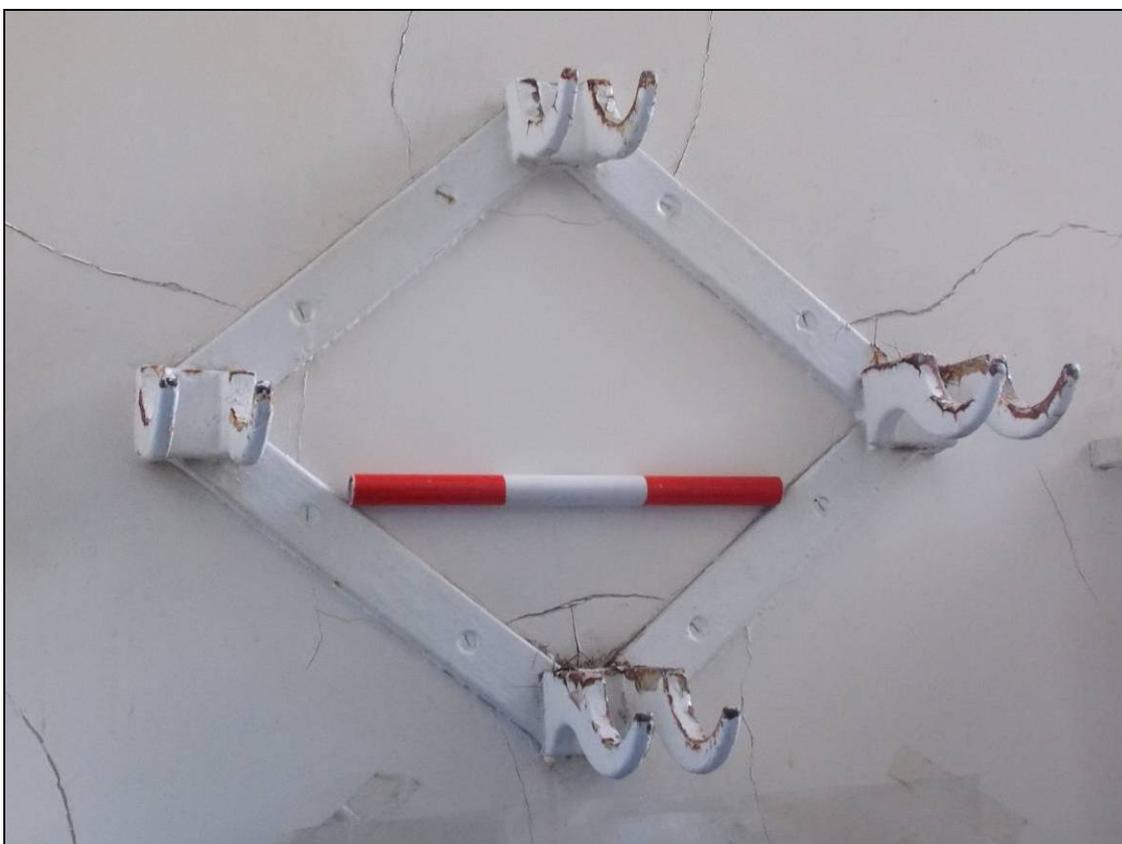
Detail of cylinder bracket within the Sink Room, looking north (scale 300mm).
